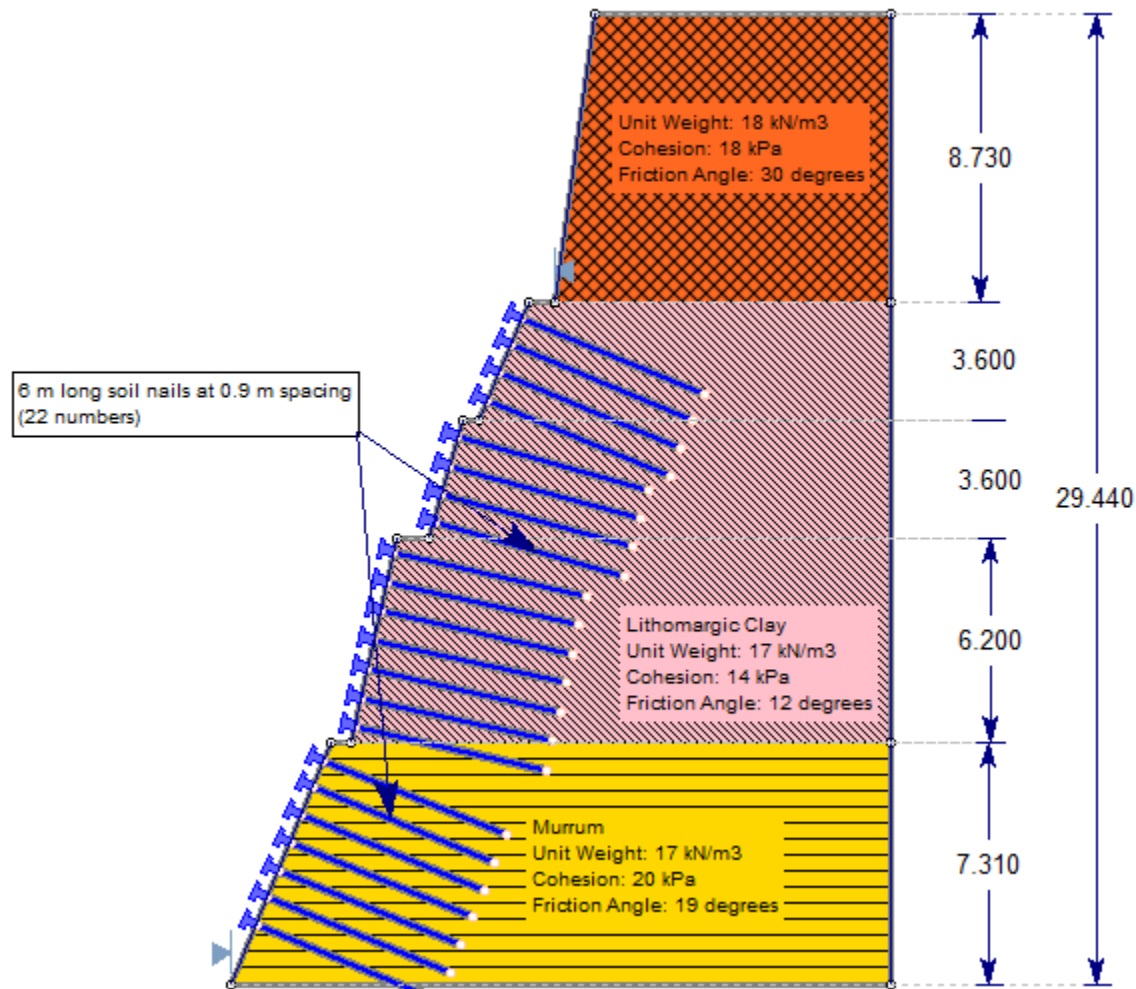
Cross-section of slope at 246.900 with remedial measure, providing 22 numbers of soil nails of 6 m length at spacing of 0.9m
